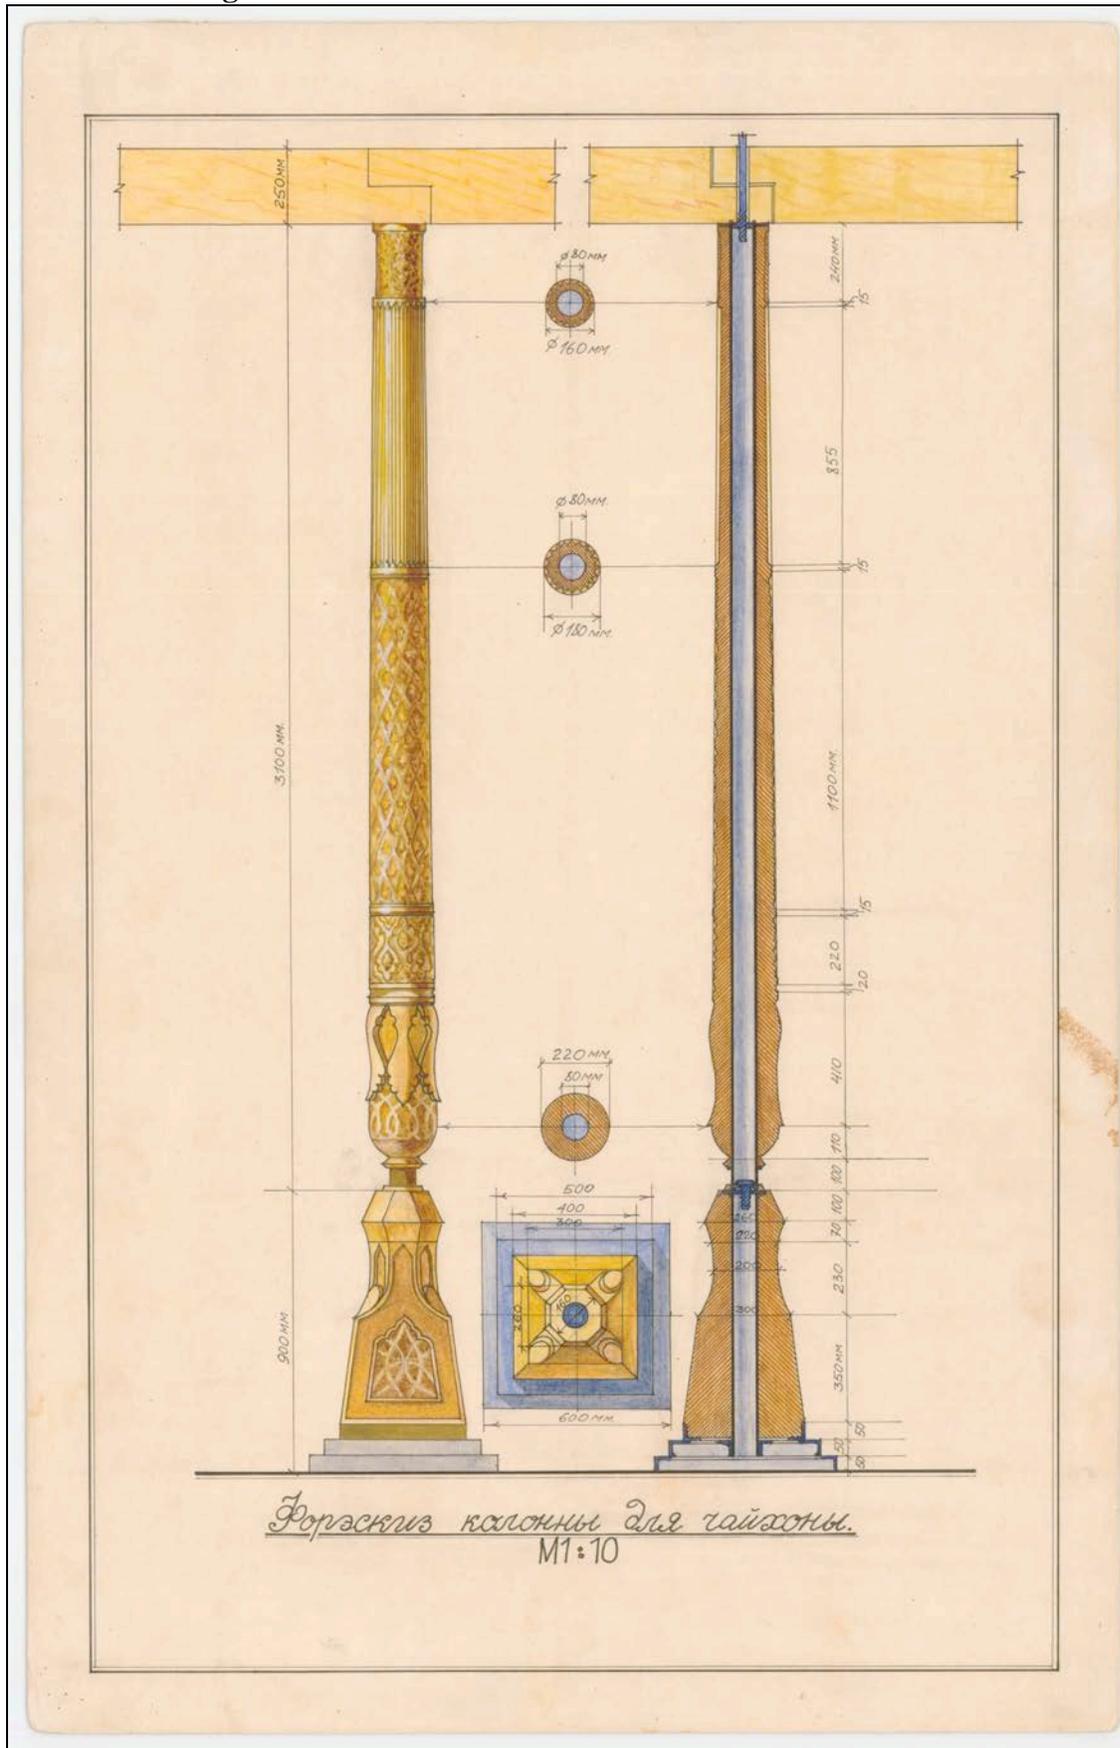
Boulder-Dushanbe Teahouse: Original Column #2 Drawing, Lado Shanidze, 1988
